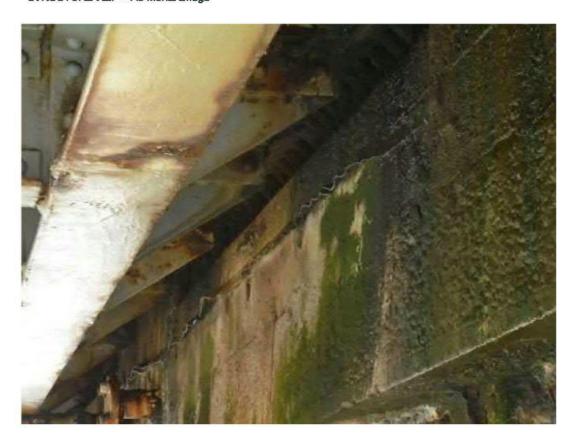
secondary deck - extensive surface corrosion to north main span bearings on pier 5
